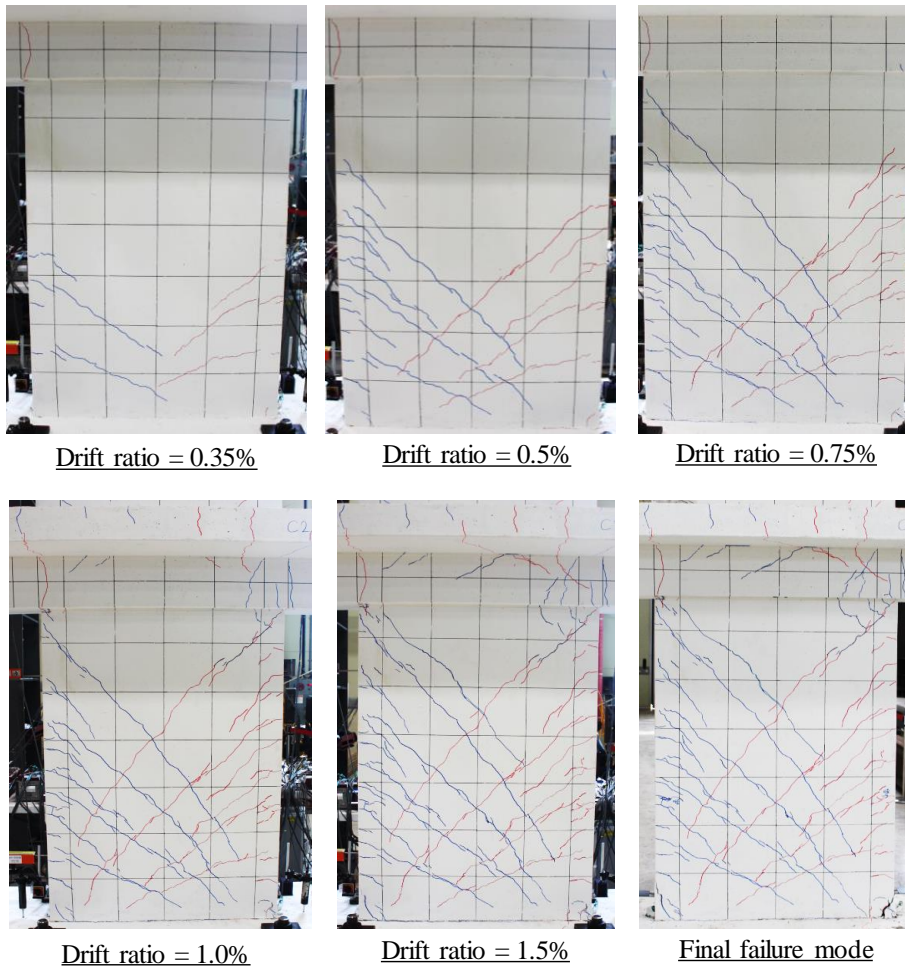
Failure sequence of 1st story shear wall according to drift ratio
